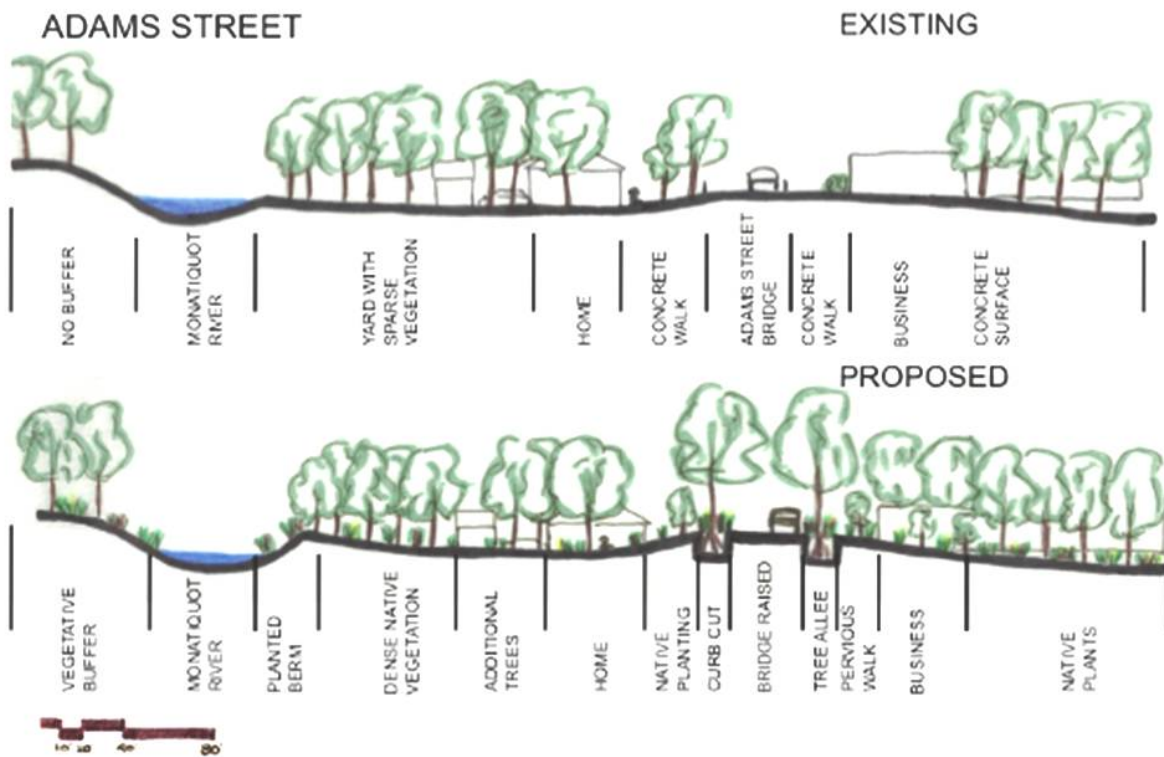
Existing and proposed cross-section rendering of Adams Street showing the application of BMPs
